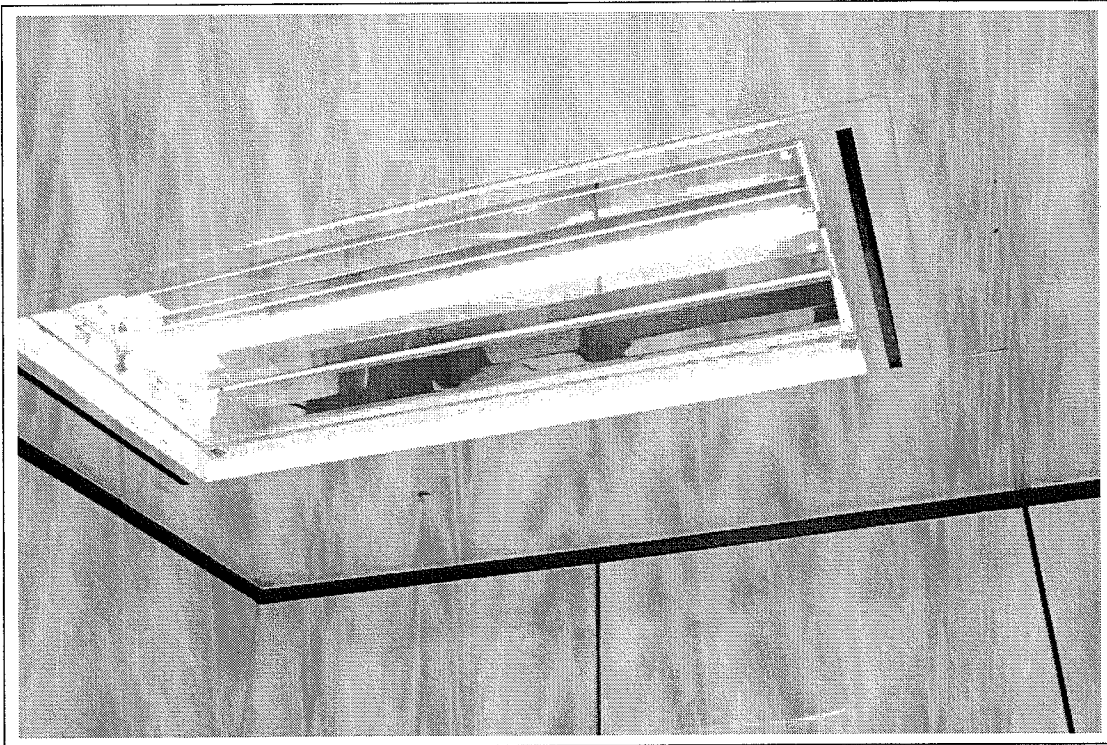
10th floor, room W1011B - General view of fluorescent light fixture/ceiling grid system
